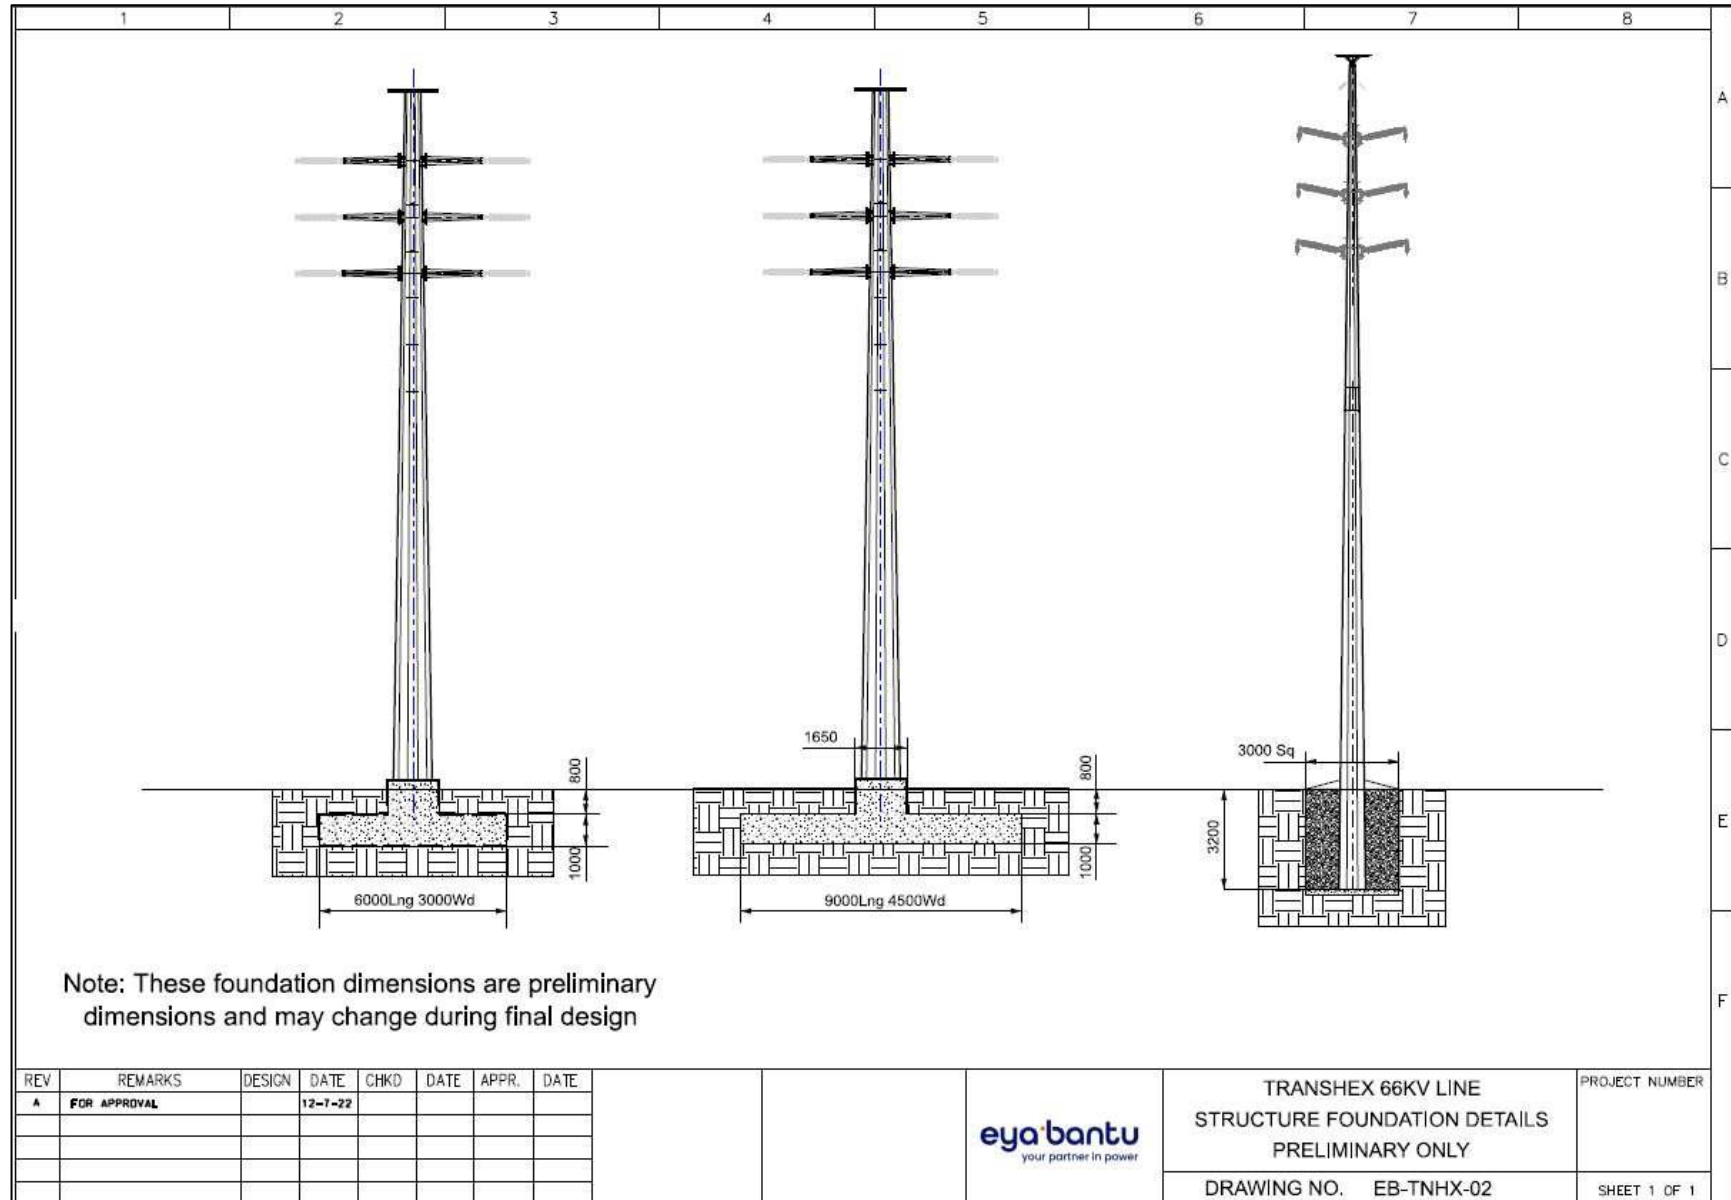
PYLON FOOTING STRUCTURE DIAGRAM
